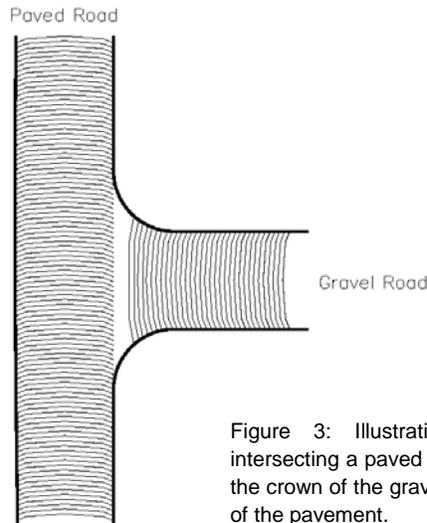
Illustration of a gravel road intersecting a paved road. Gradually eliminate the crown of the gravel road to match the edge of the pavement.
